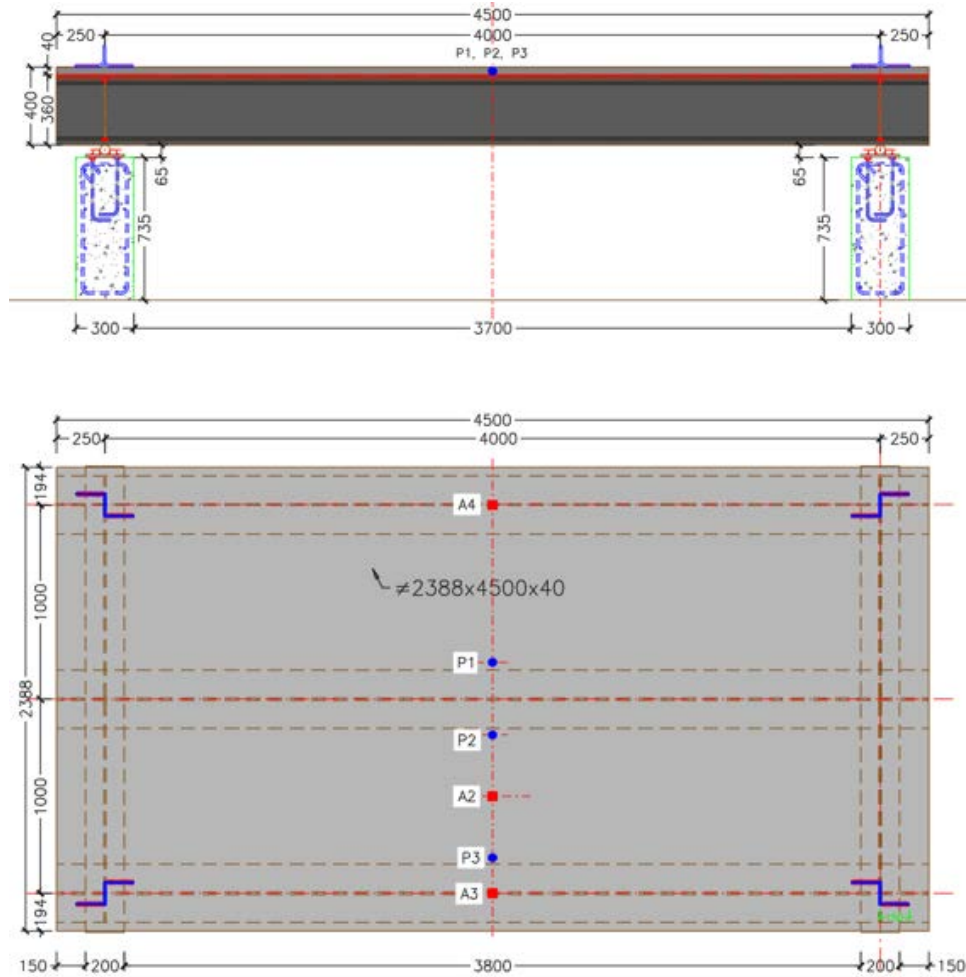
Test specimen. a) plan view; b) front view (units: mm).
